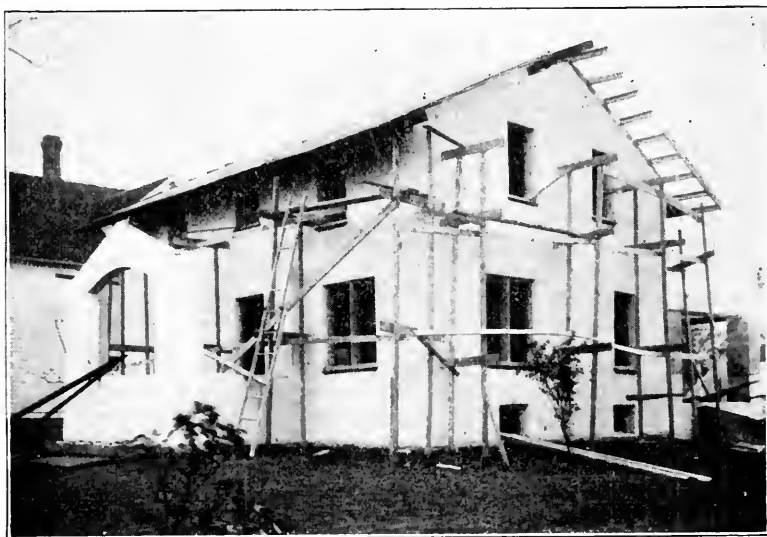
FRONT VIEW DURING CONSTRUCTION, SHOWING ROOF CONSTRUCTION BEFORE CONCRETE WAS APPLIED.
